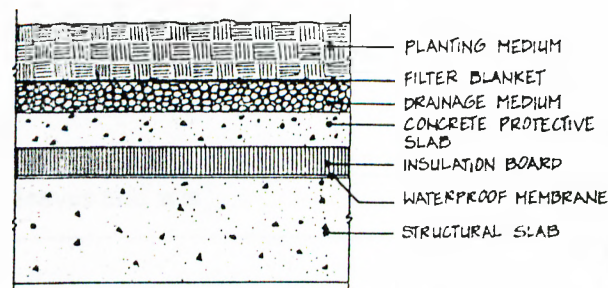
Cross section through roof (Osmundson, 1988, p. 610-2).
